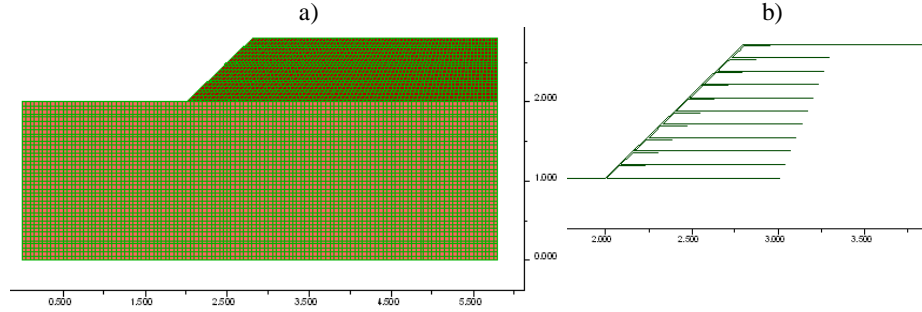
The retaining wall: a) geometry, b) soil reinforced with geosynthetic.
